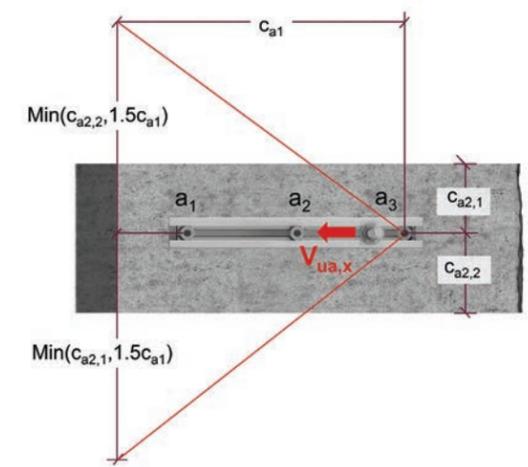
Acute corner — Longitudinal shear — Plan view.
